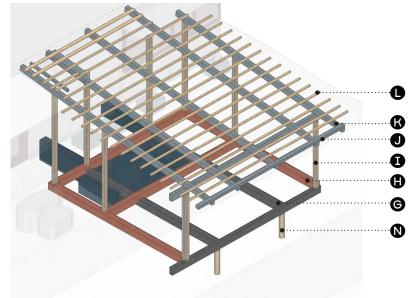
| A representation of roof and flooring system of Kevin's bedroom (Source: CAC, September 2024).
